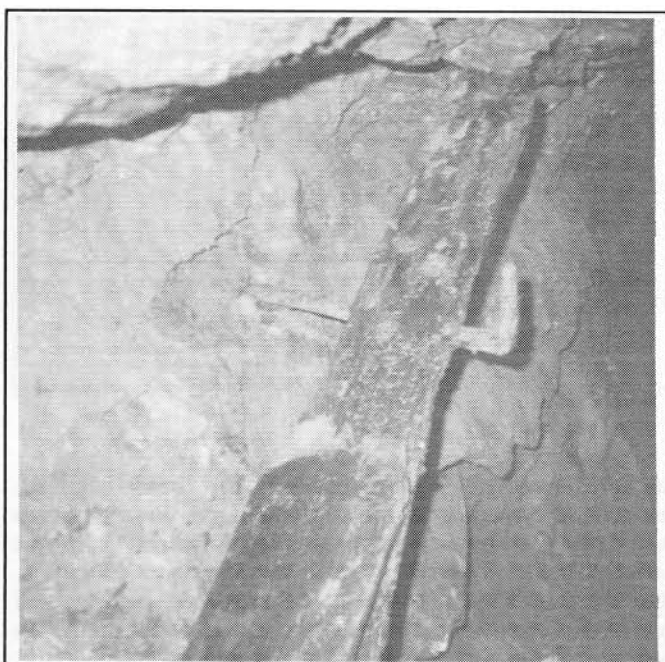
Wooden trunking in the adit, showing iron retaining spikes.
